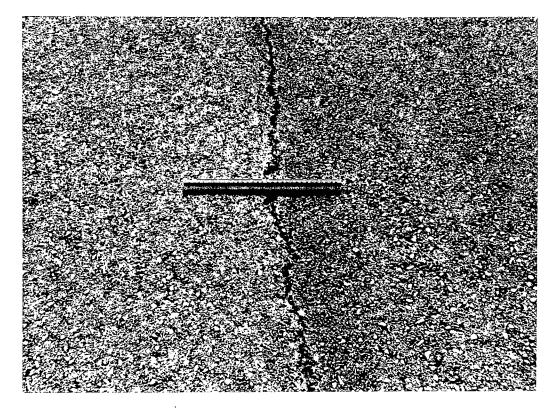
Typical longitudinal cracking, Runway 15-33 (R3C)
